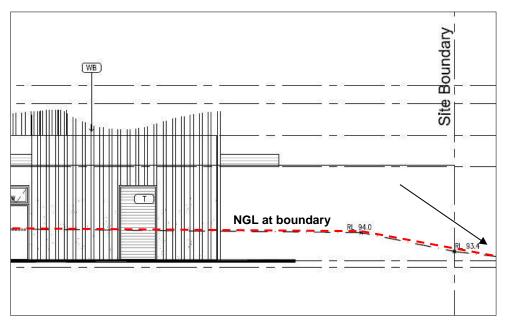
Shows the south end of the east elevation plan, which indicates the possibility of the cut extending to the south boundary.
